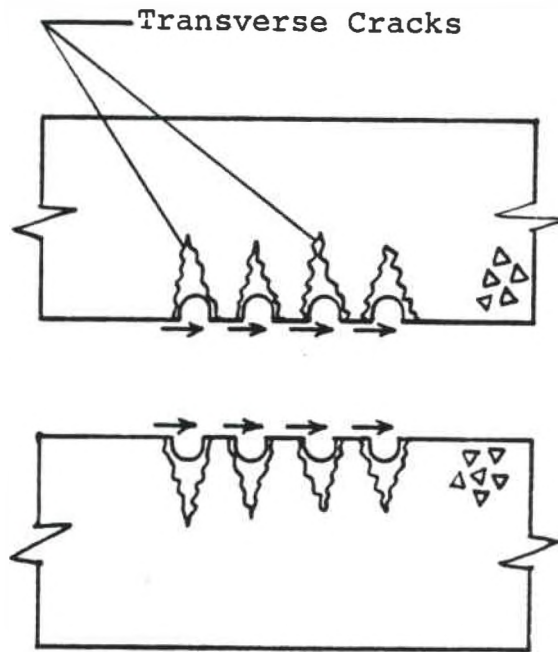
Transverse Cracking Due to Principal Tensile Stress.
